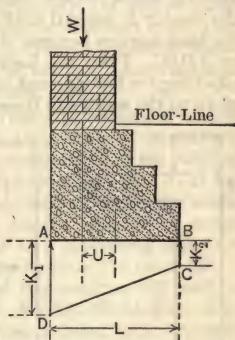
Offset Footing. Varying Pressure on Foundation-bed
